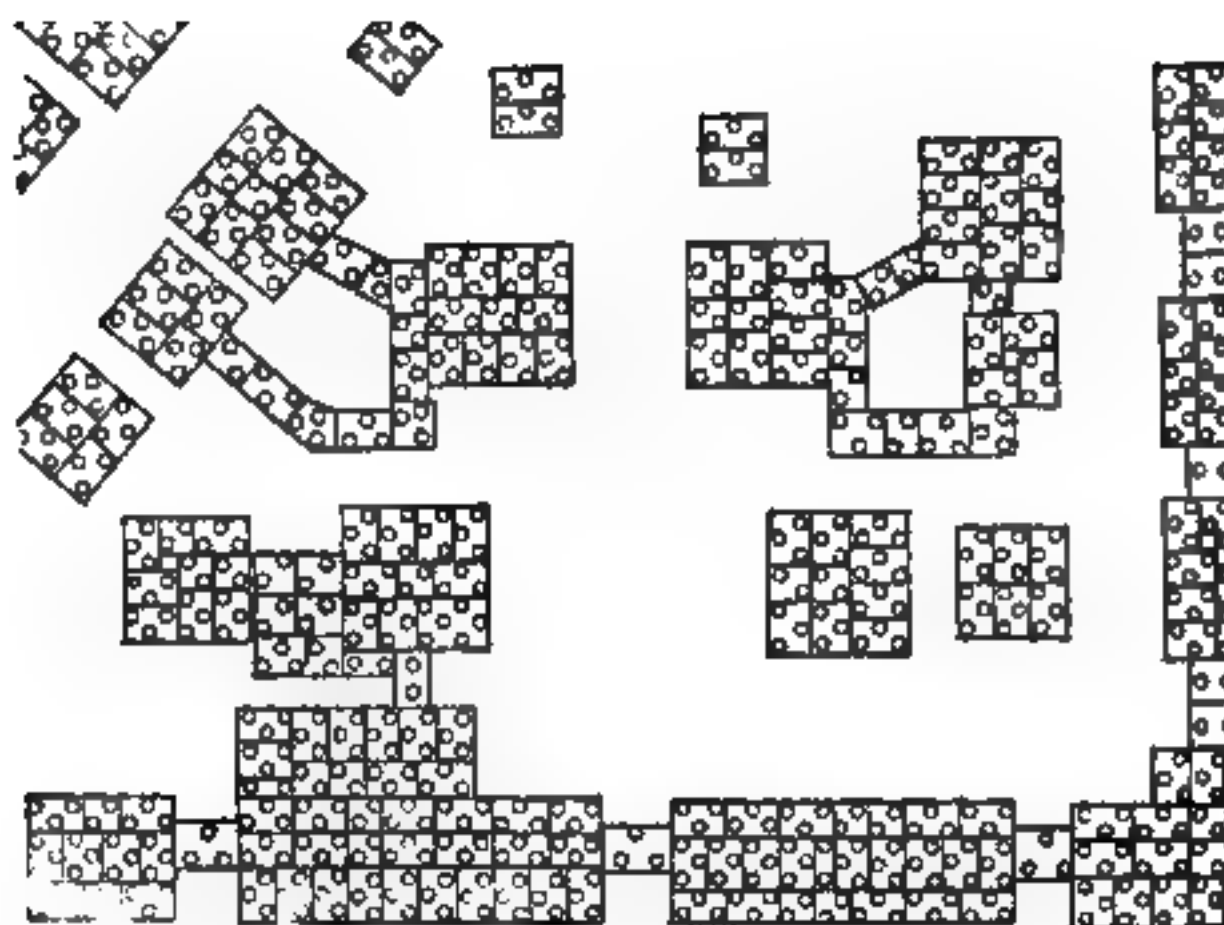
Piling-plan, Chamber of Commerce Building, Boston, Mass.
